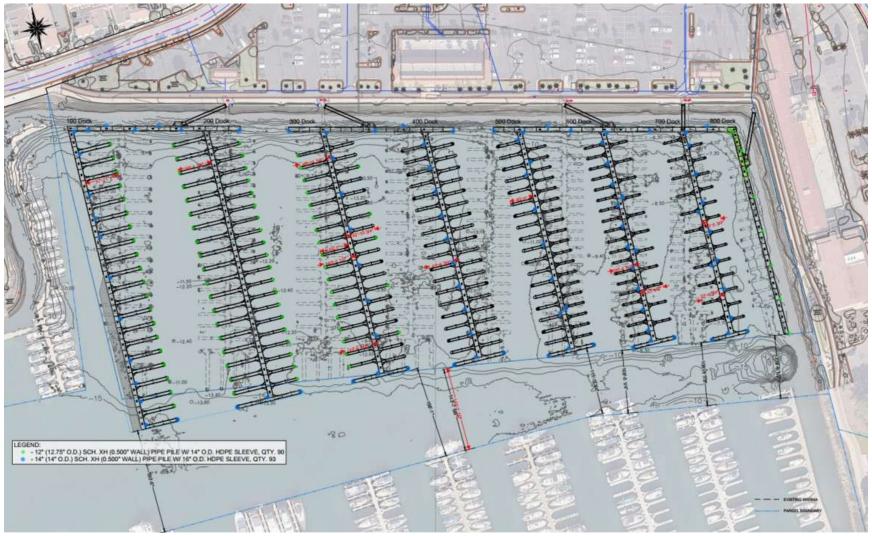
Map of proposed pile layout. Twelve-inch piles are shown in green and 14-inch piles are shown in blue. Plan map provided by Bellingham Marine Industries.
